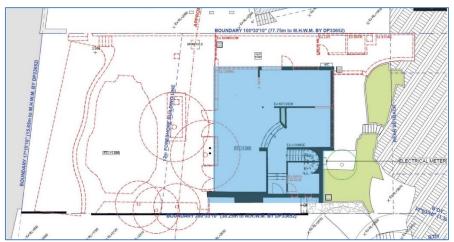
No demolition is to occur in the blue shaded area except as noted above.
